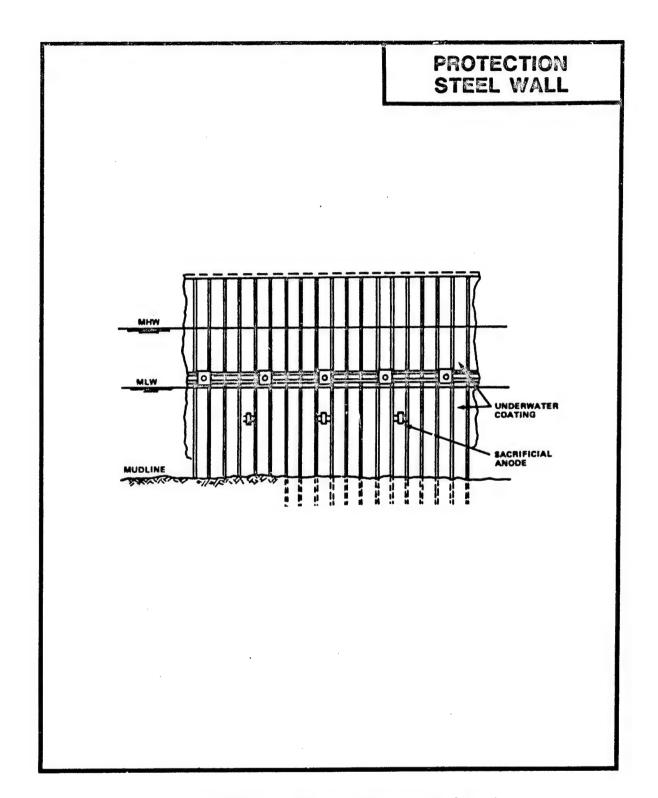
Coating/Cathodic Protection of Steel Sheet Pile Wall.
